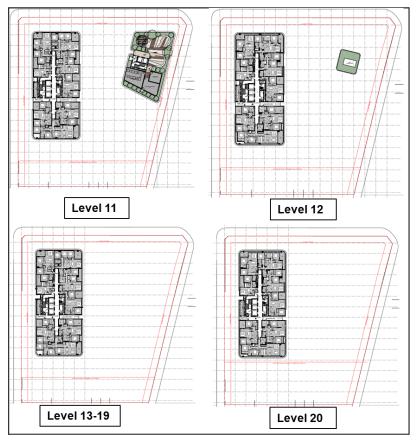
| Proposed Floor Plans (Source: Applicant's Architectural Plans, Rev F dated 27/05/2024)
